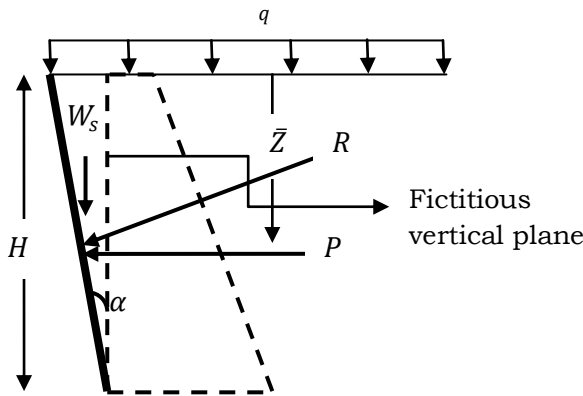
At-rest force for a retaining wall with an inclined backface.
